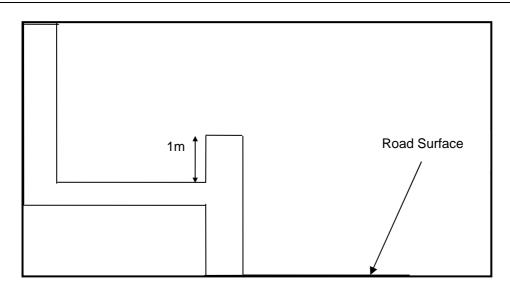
Botley Road Bridge, Option for Cross Section through non-deck section
